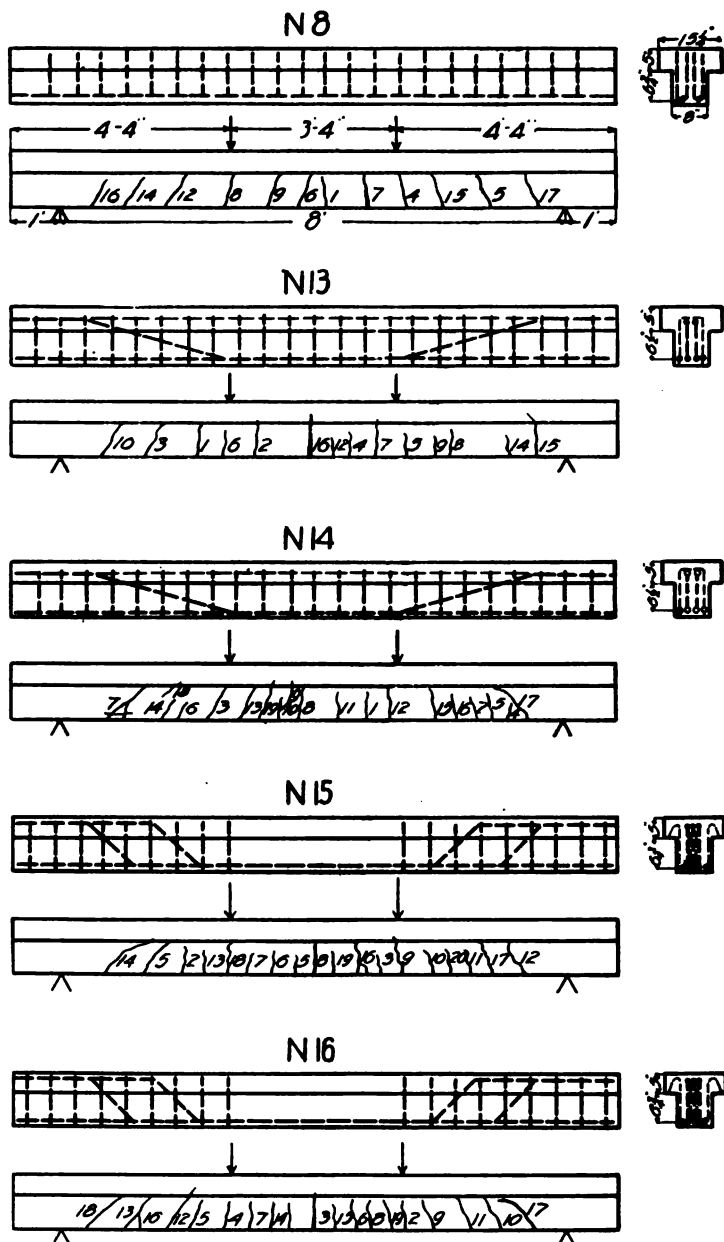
BEAMS OF SERIES N—REINFORCEMENT AND CRACKS.
